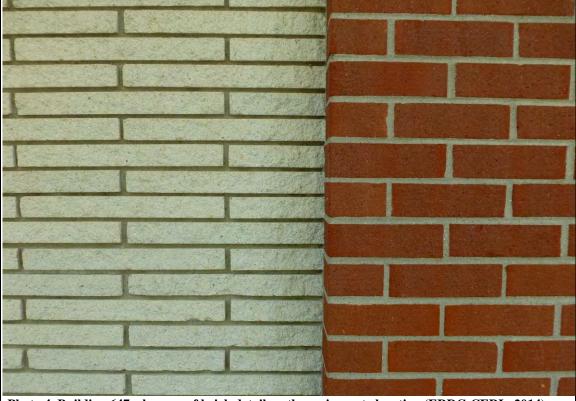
Building 647, close-up of brick detail on the main, east elevation (ERDC-CERL, 2014).
